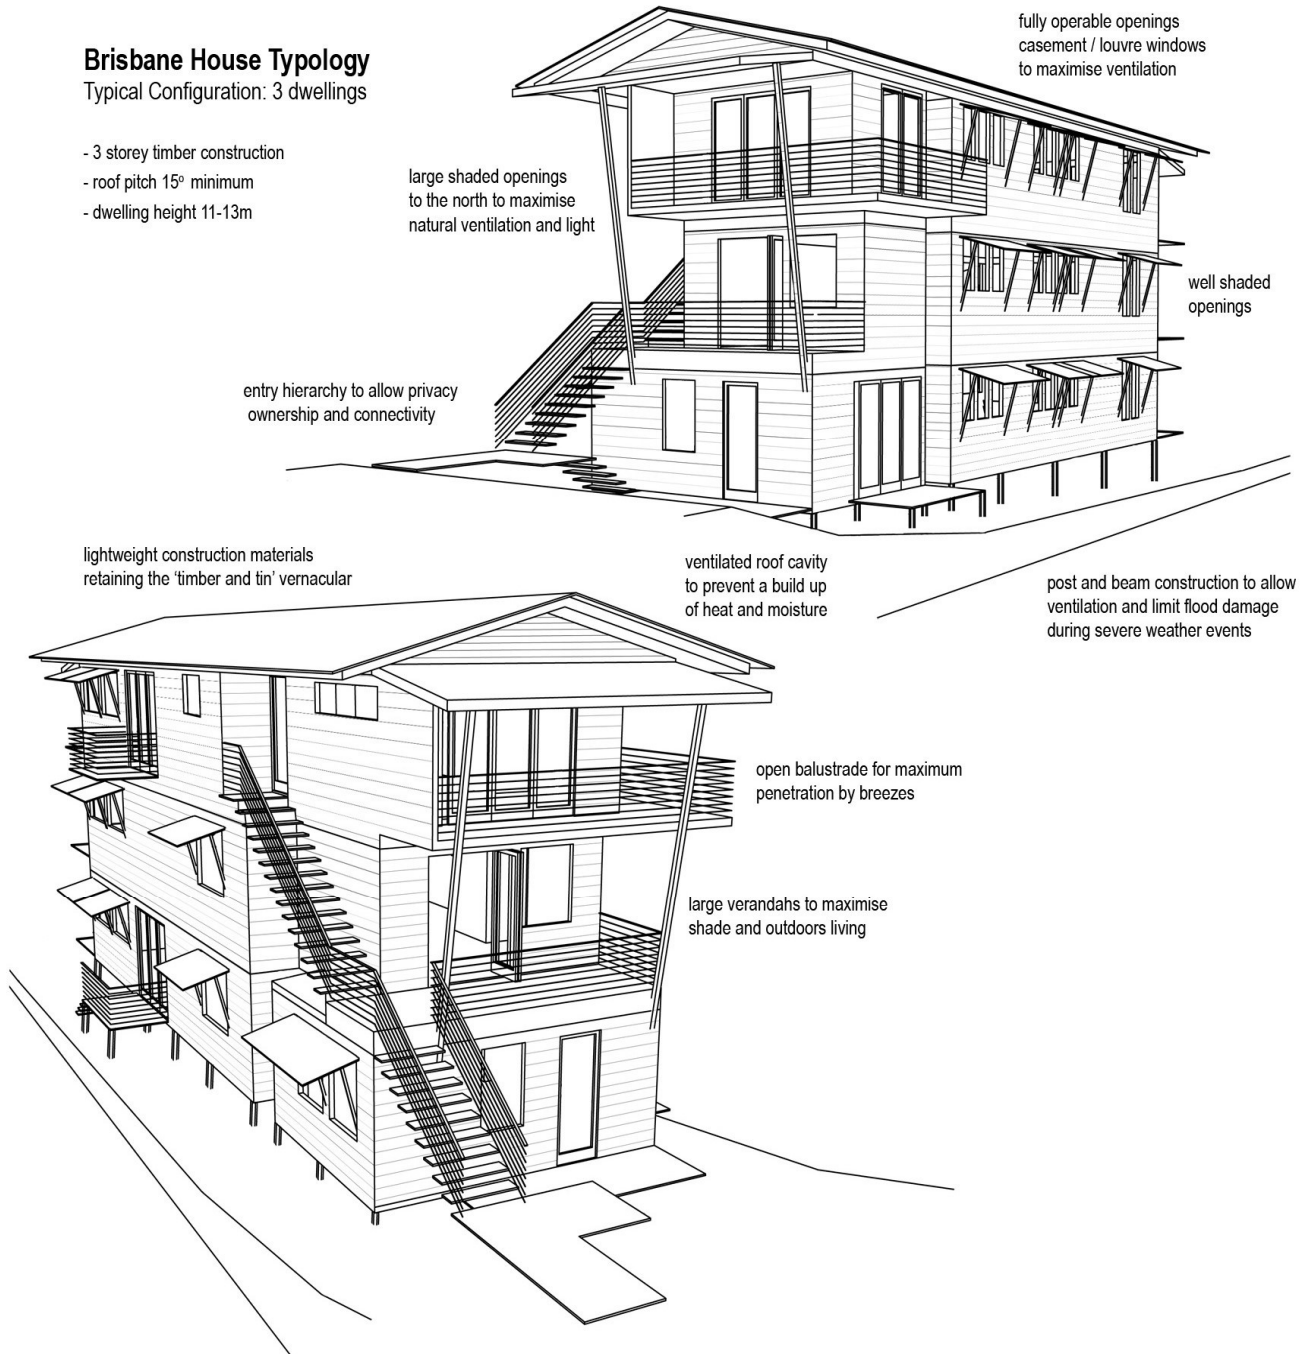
New housing typology - Brisbane House diagram (by Author)
